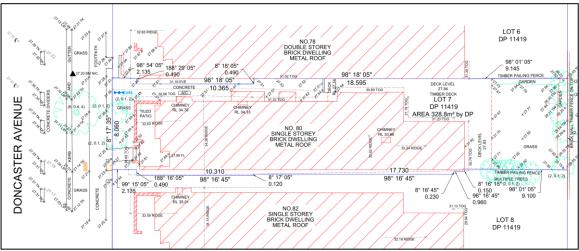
Survey Plan of subject site (Source: Survade Residential & Construction Surveyors).
